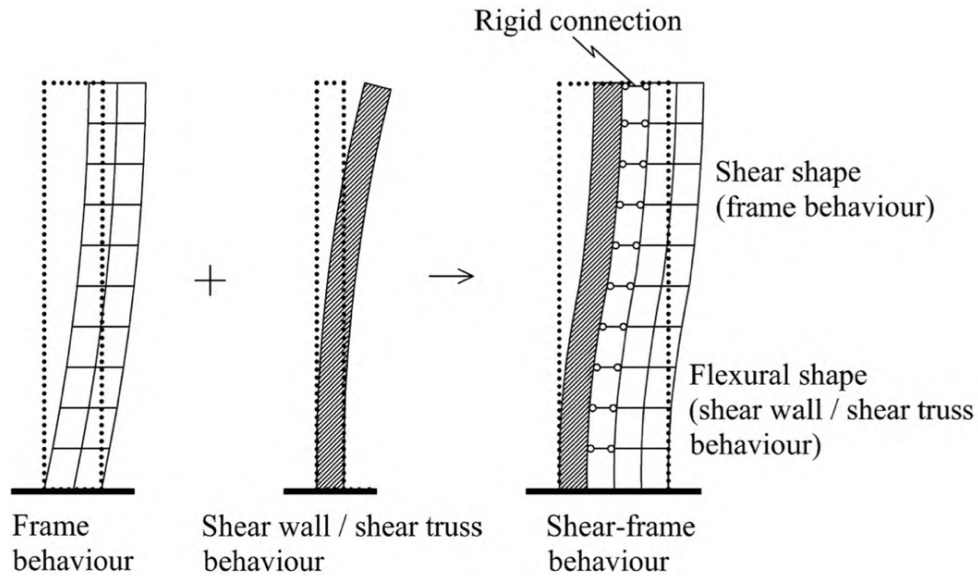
Behavior of the rigid frames and shear walls/trusses acting alone and together (source: [2])
